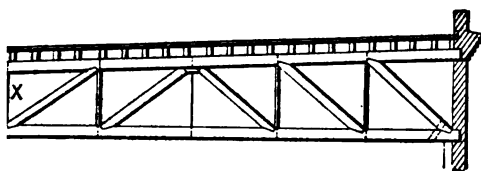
Six-panel Howe Truss with Top Chord Inclined
